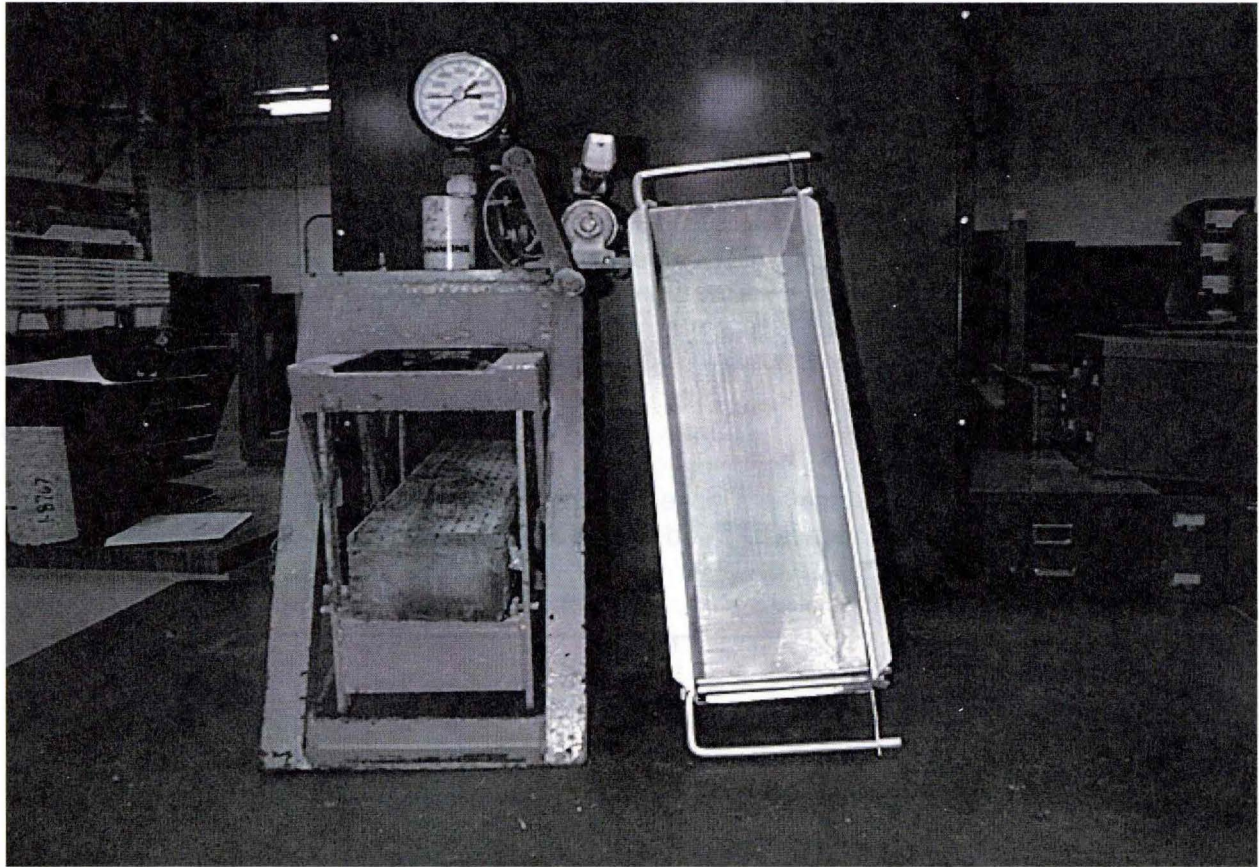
Concrete Specimen in Hydraulic Testing Machine
